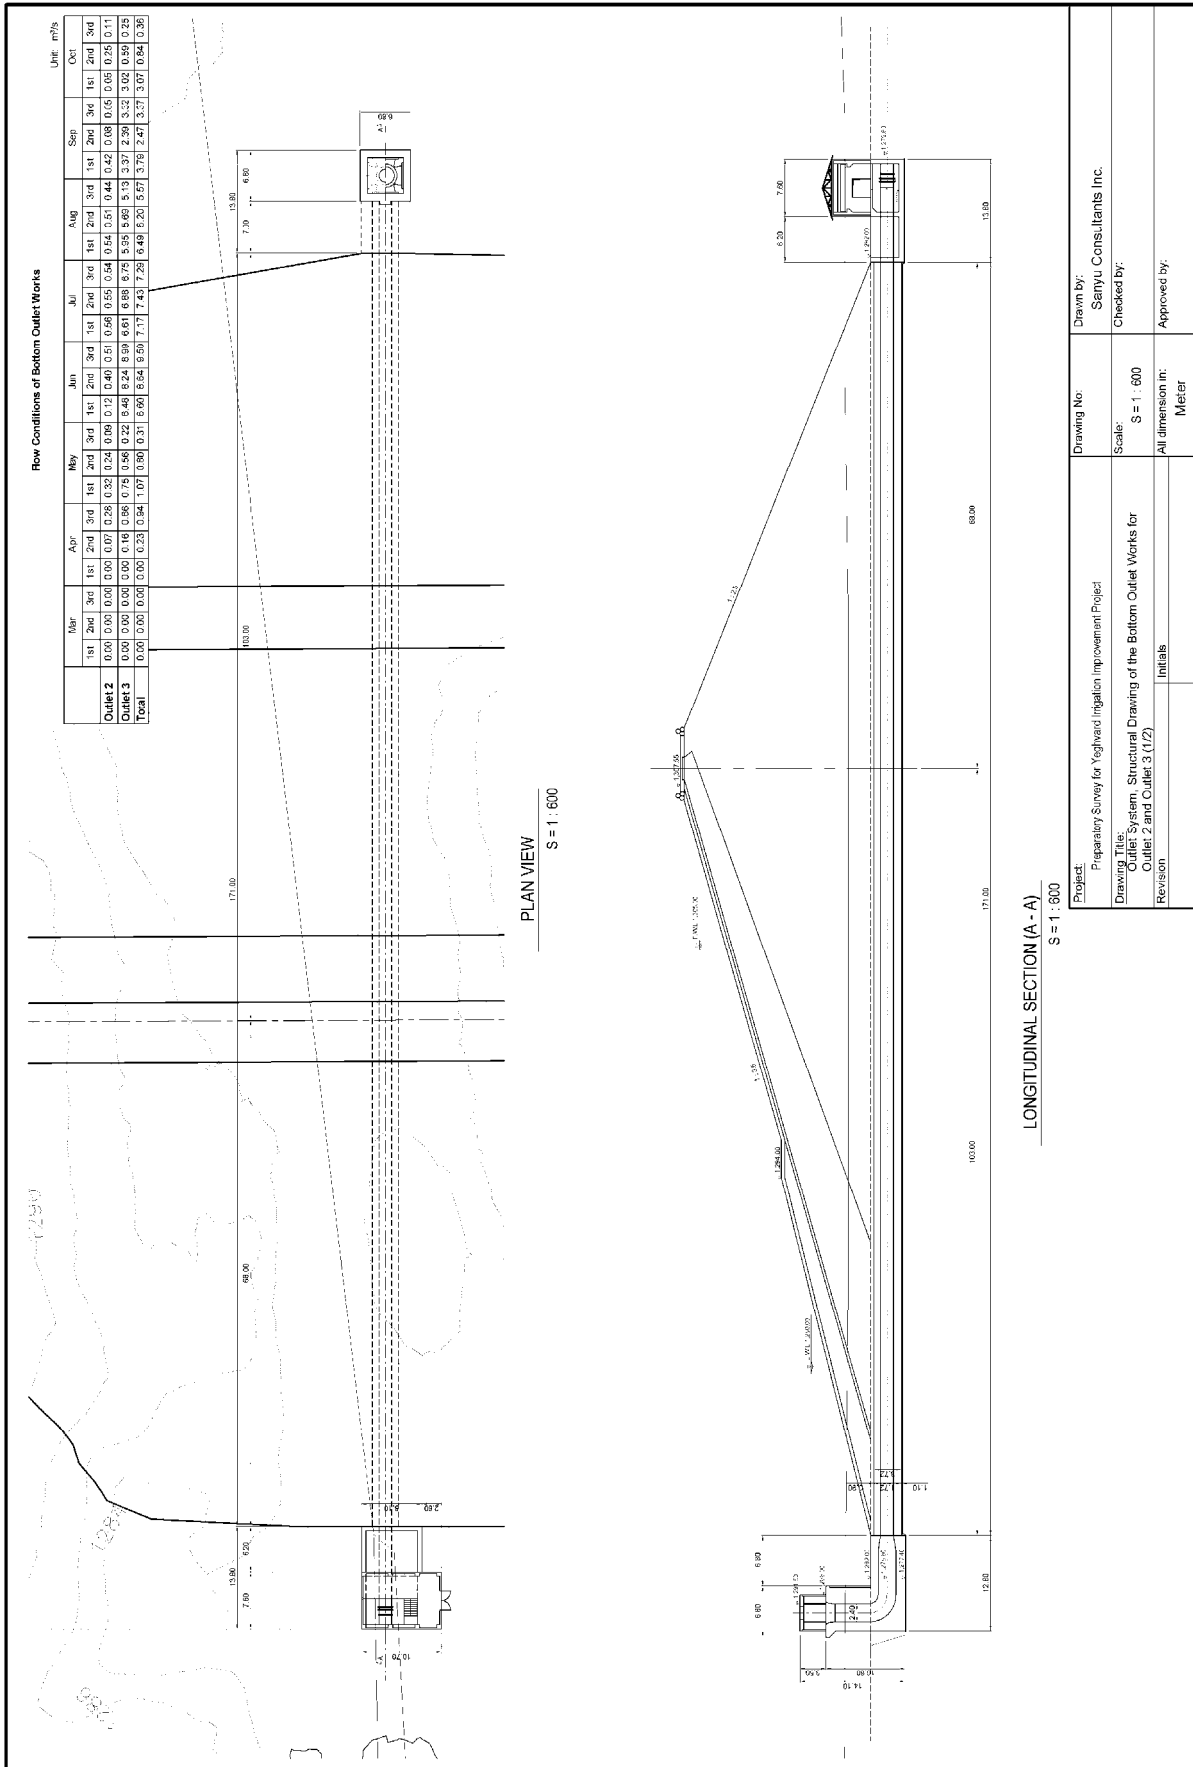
Structural Drawing of the Bottom Outlet Works
